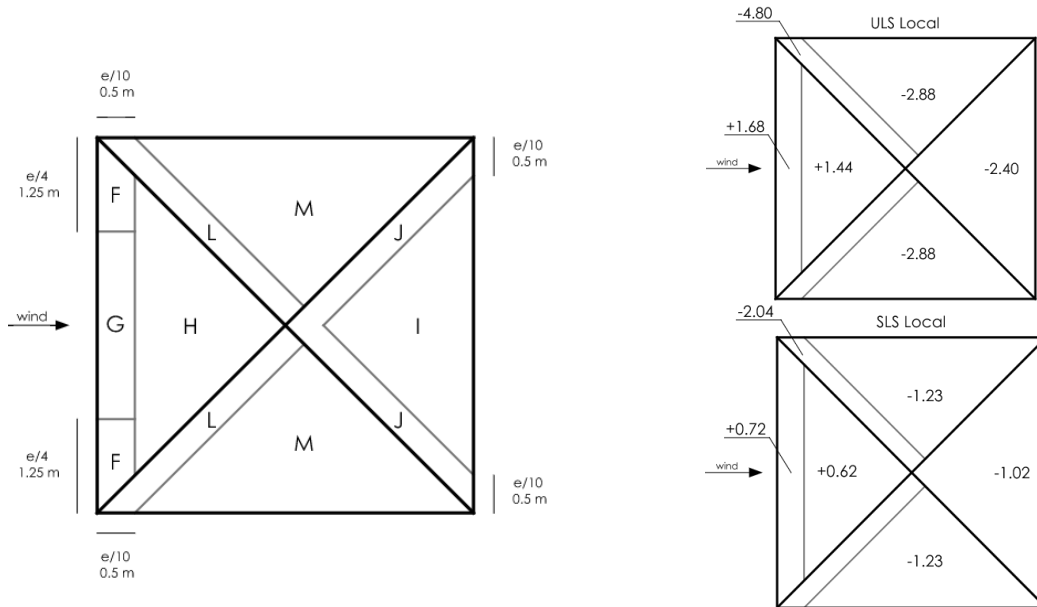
Wind load surface sections (left), corresponding local roof loading in ULS and SLS (right)
